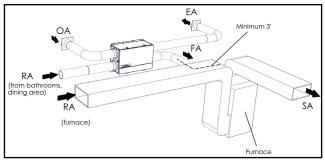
SEPARATE ROOM AIR PICK-UP—FRESH AIR TO FURNACE RETURN AIR TRUNKLINE
